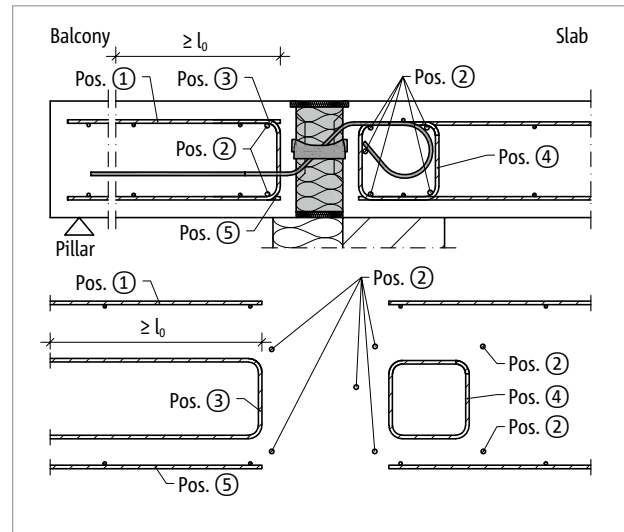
Schöck Isokorb® T type Q-E-W-V: On-site reinforcement
